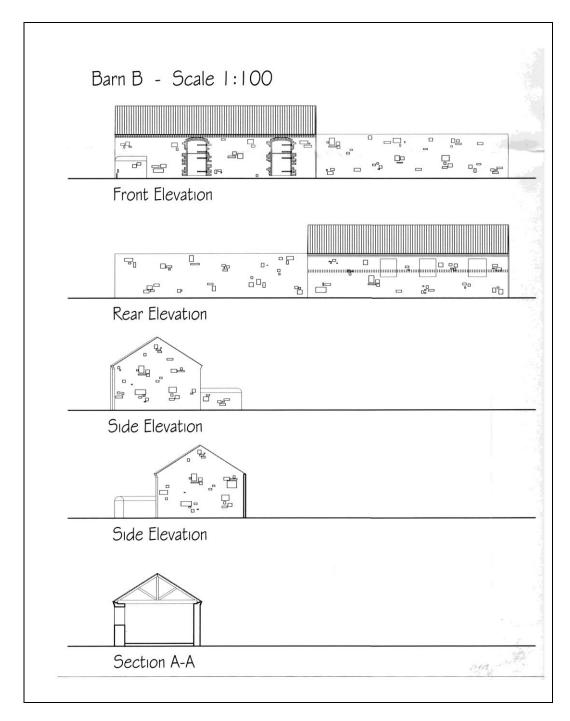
Barn B drawing. Source:HSSP Architects. Original scale 1:100
